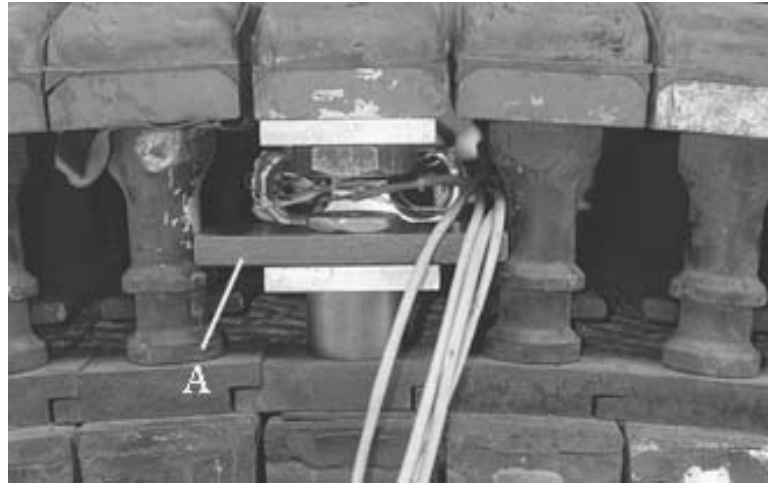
Side view of the two octagonal ring transducers installed between the track element and the track base assembly.
